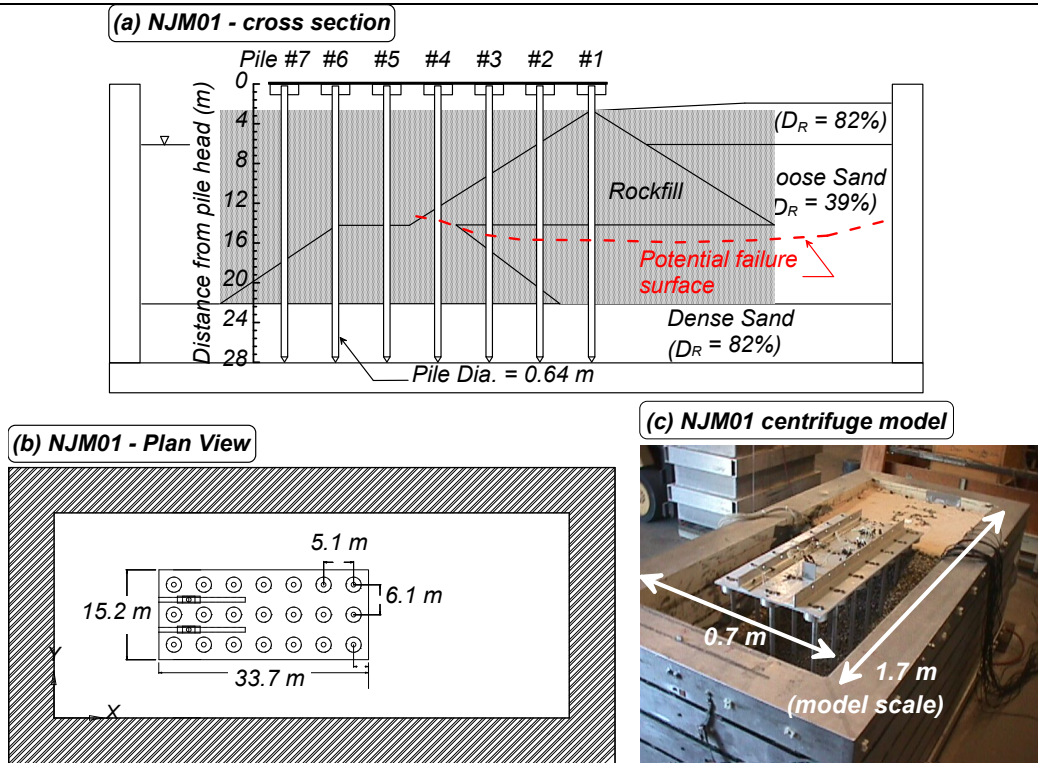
Centrifuge test NJM01 layout properties: (a) Cross section, (b) plan view, and (c) experimental model.
